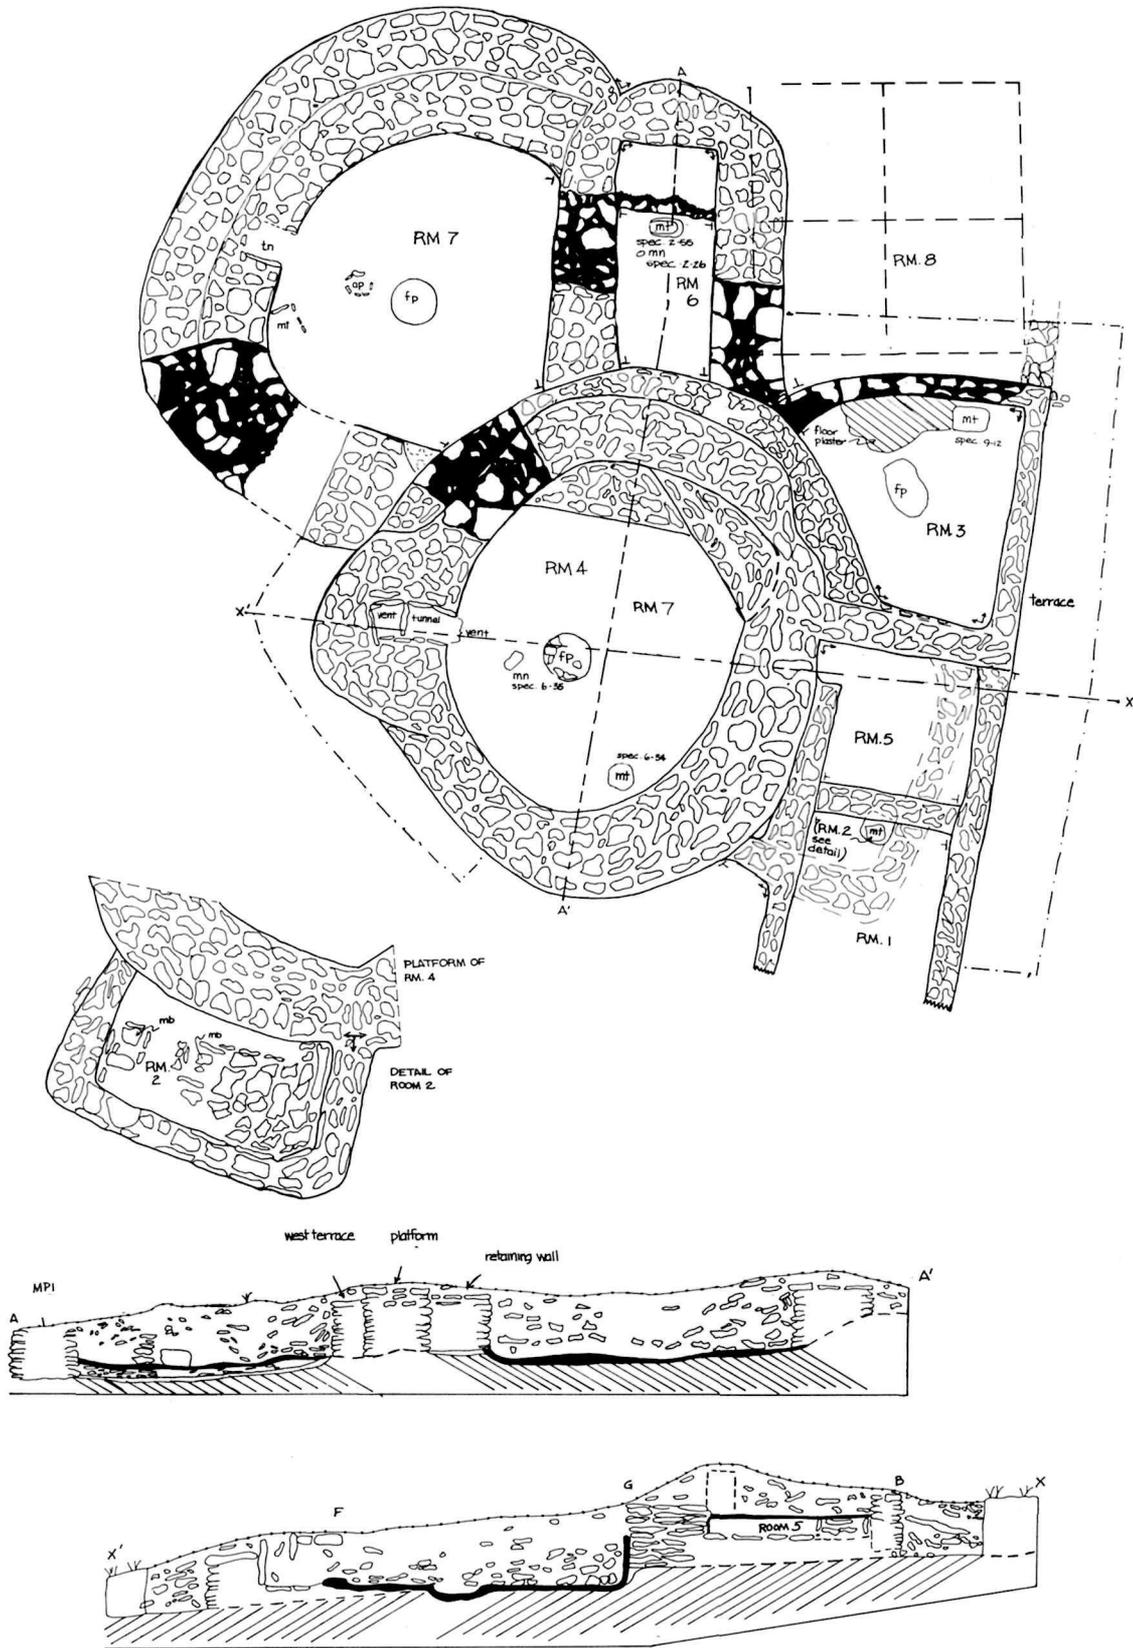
Plan showing room layout of Building 3, 5AA92.
